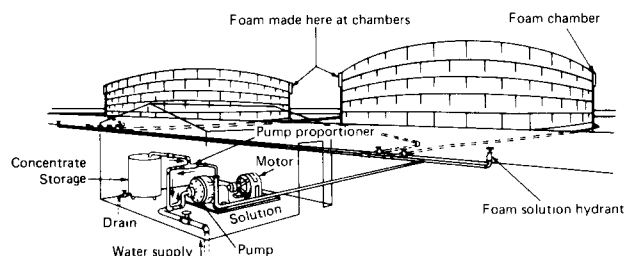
Schematic Arrangement of Air Foam Protection for Storage Tanks.
